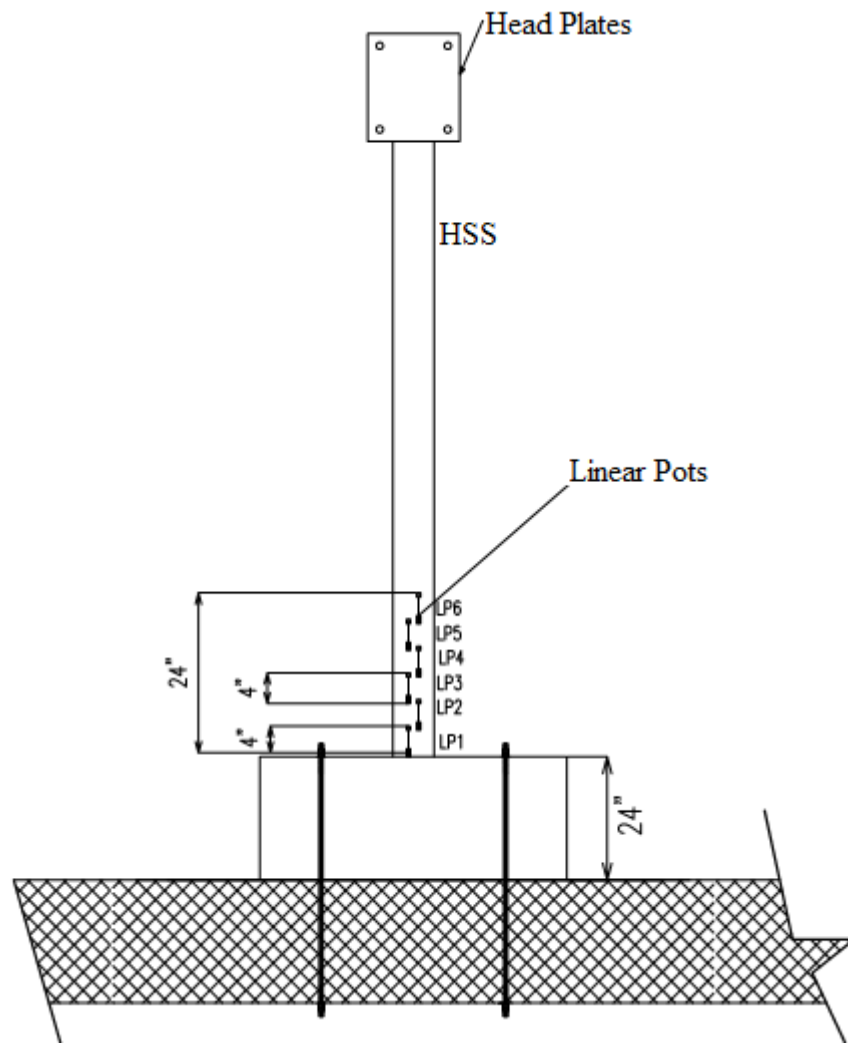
Schematic Diagram for a Typical West Side View of Tested CFSSP-Wall Specimen
